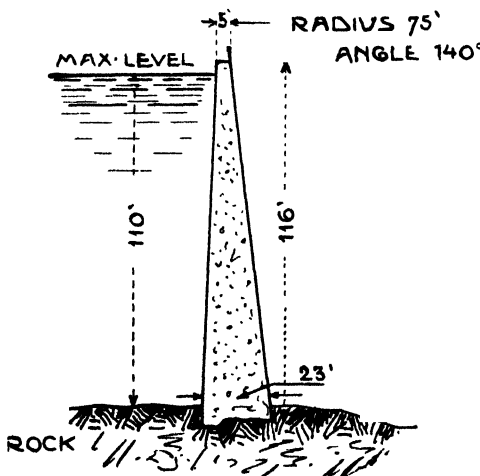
Corfino arched dam (made of Portland cement concrete not armoured).
